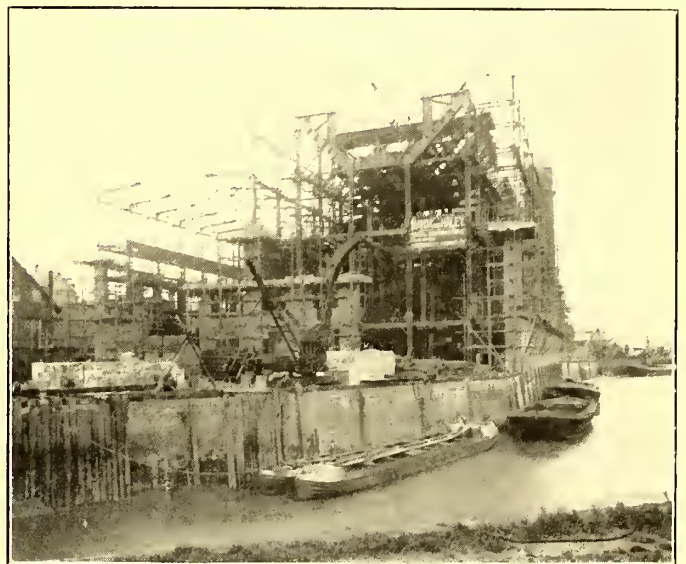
THAMES RIVER ELEVATION, WEST END
